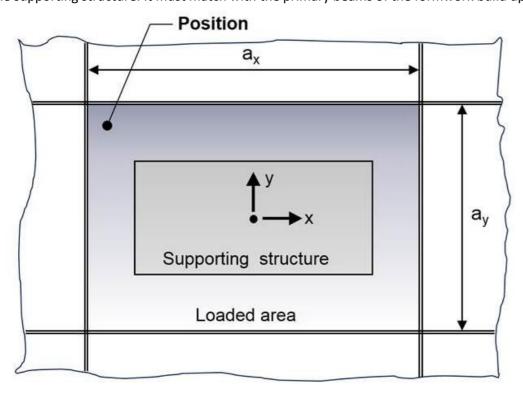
Layout of a shoring unit as segment of a formwork pattern
